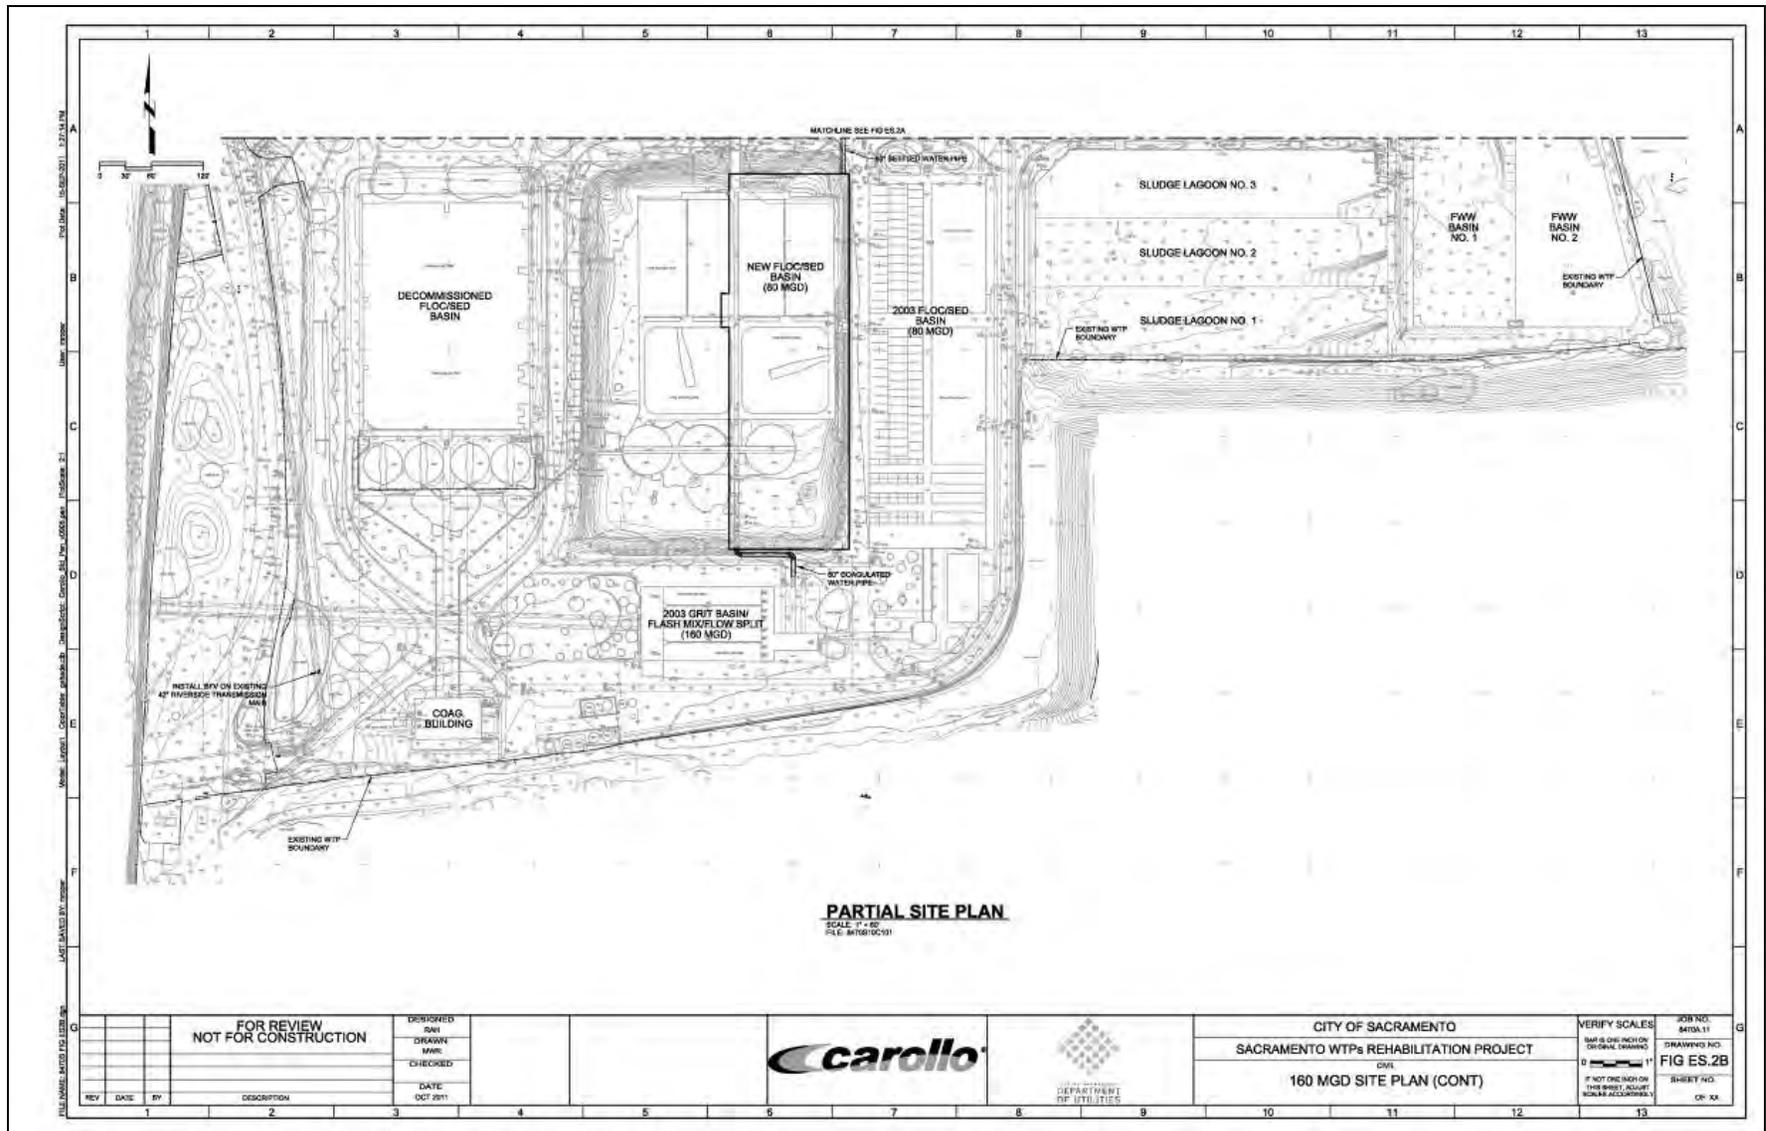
Site plan showing location of new sedimentation basin outlined in center of image outlined in black. Image courtesy of City of Sacramento.
